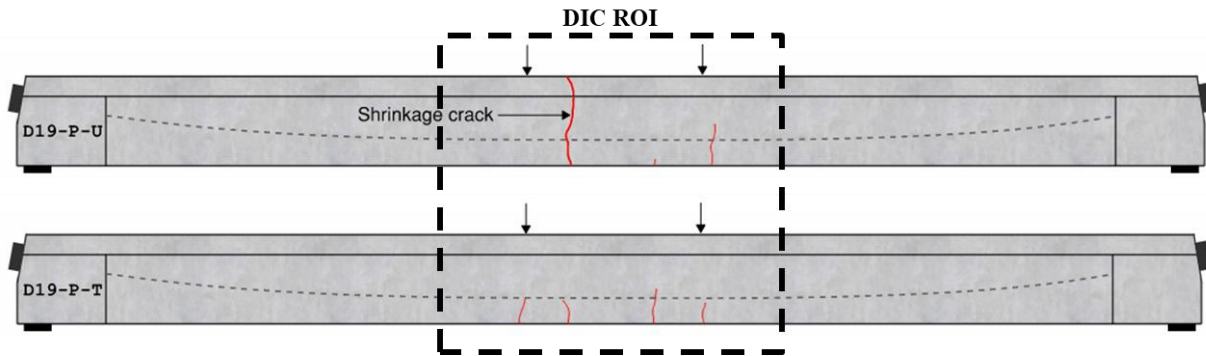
Crack map showing the observed cracks on the east face of the D19-P beam specimens at the cracking load (concrete tensile stress at  $12\sqrt{f'_c}$ ).
